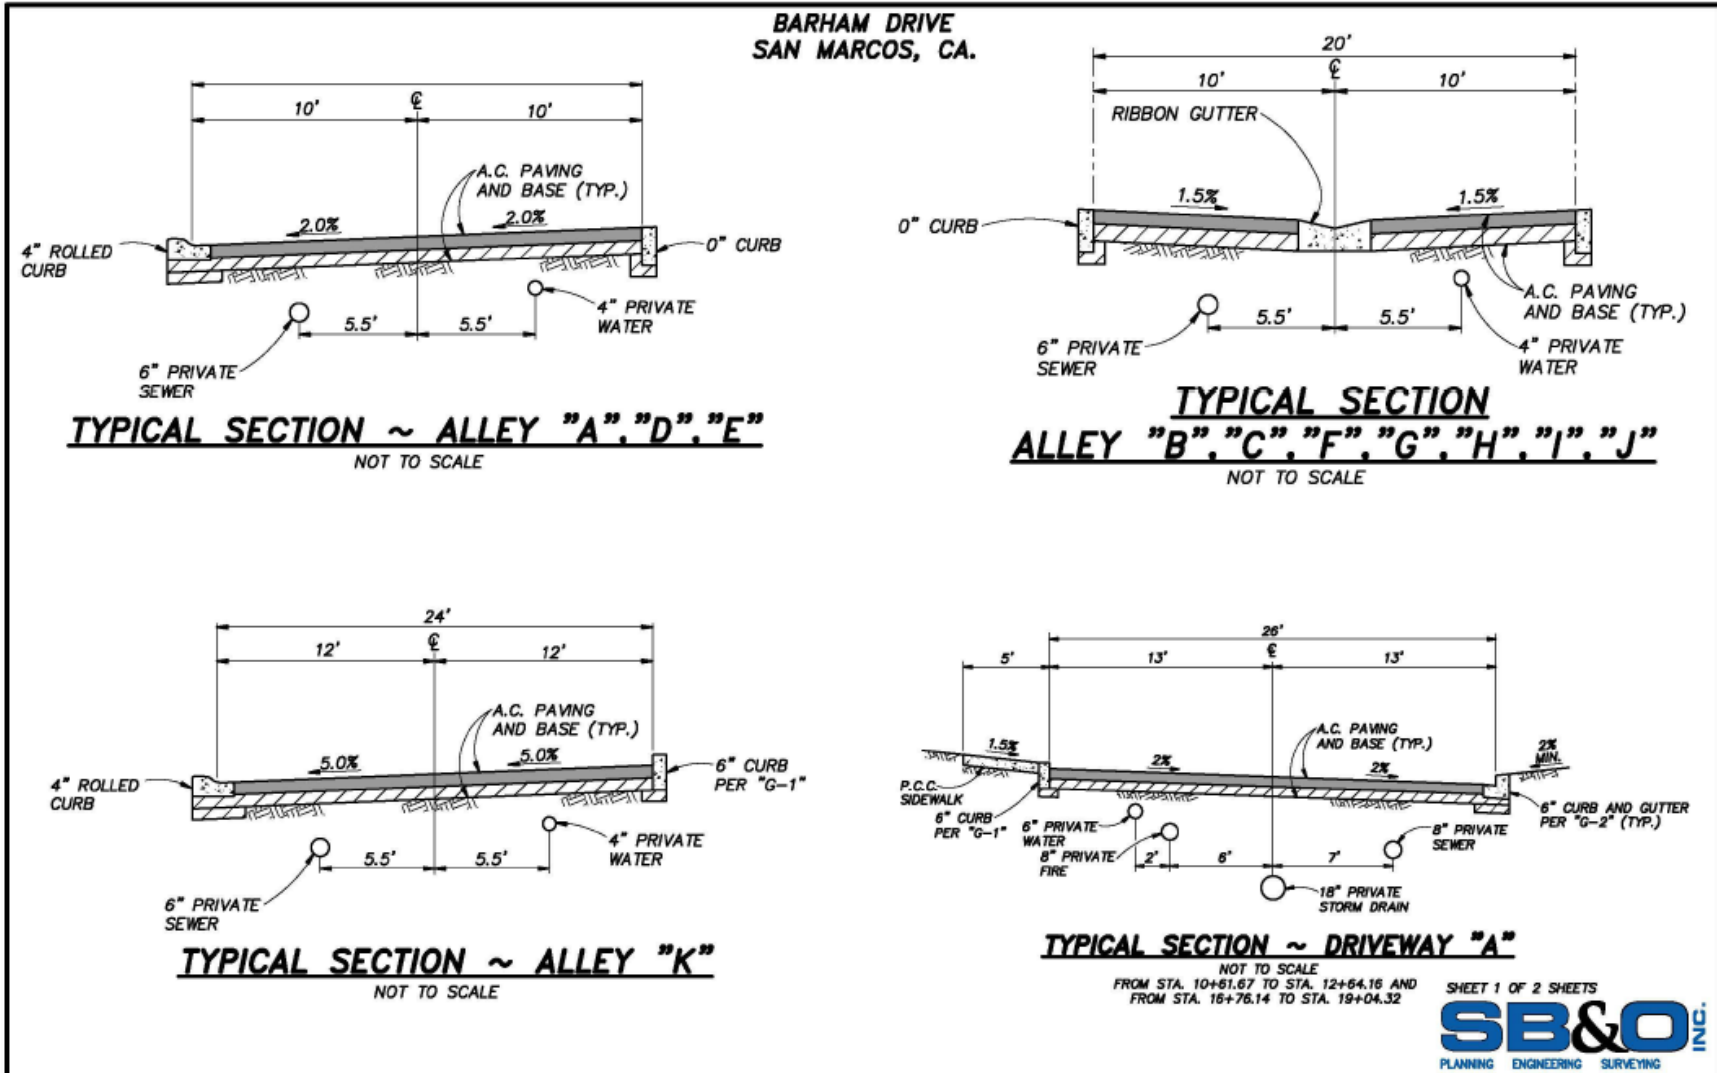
Private Alley and Driveway Cross Section (2 of 2)
